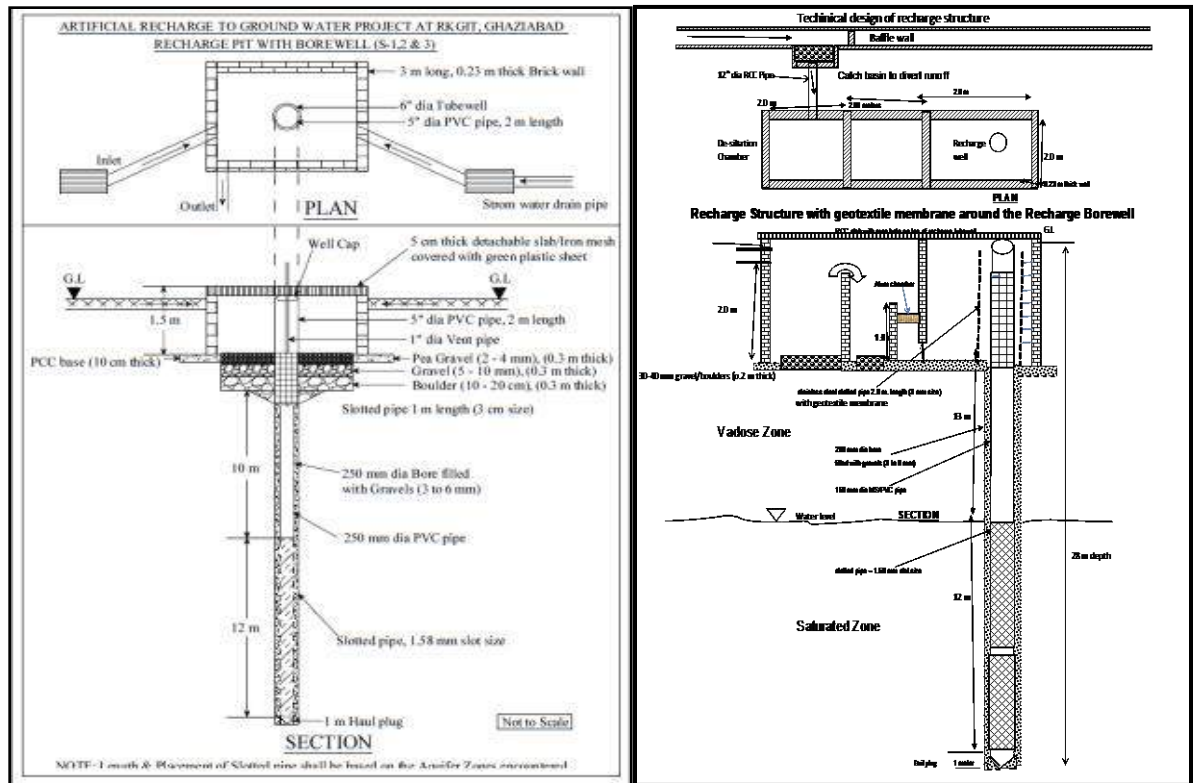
Standard Design of rooftop rain water harvesting structure
